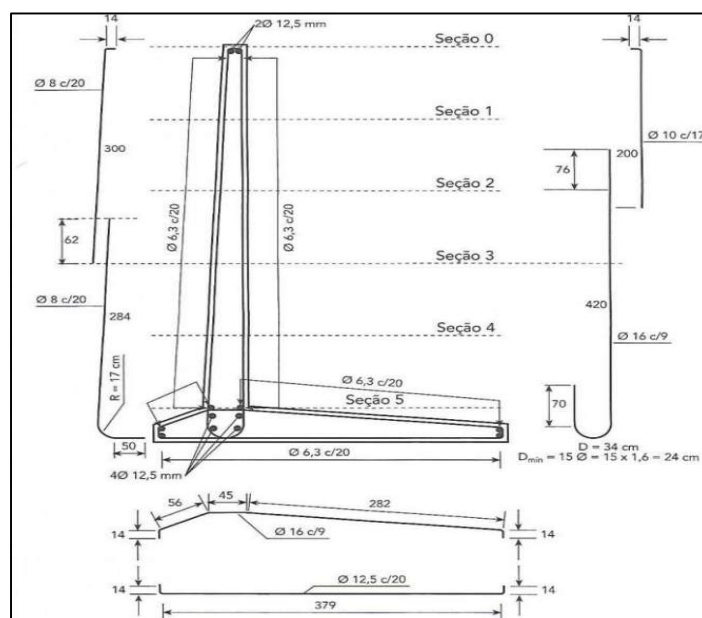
Cantilever wall made of reinforced concrete. Source: Marchetti (2007).
